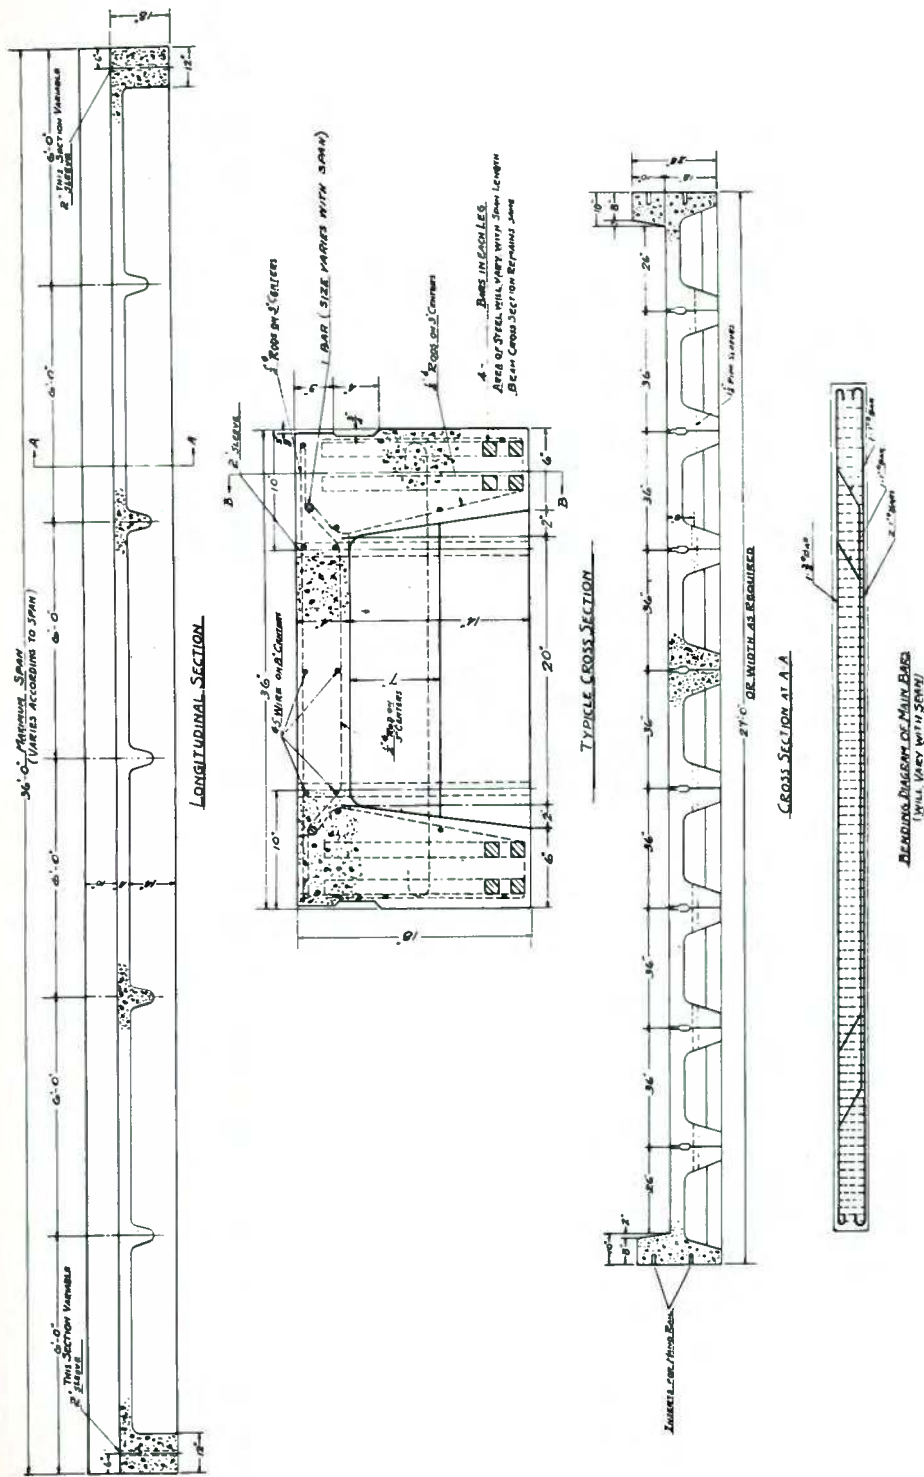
Typical precast concrete channel slab as used around 1950 in Pennsylvania.
